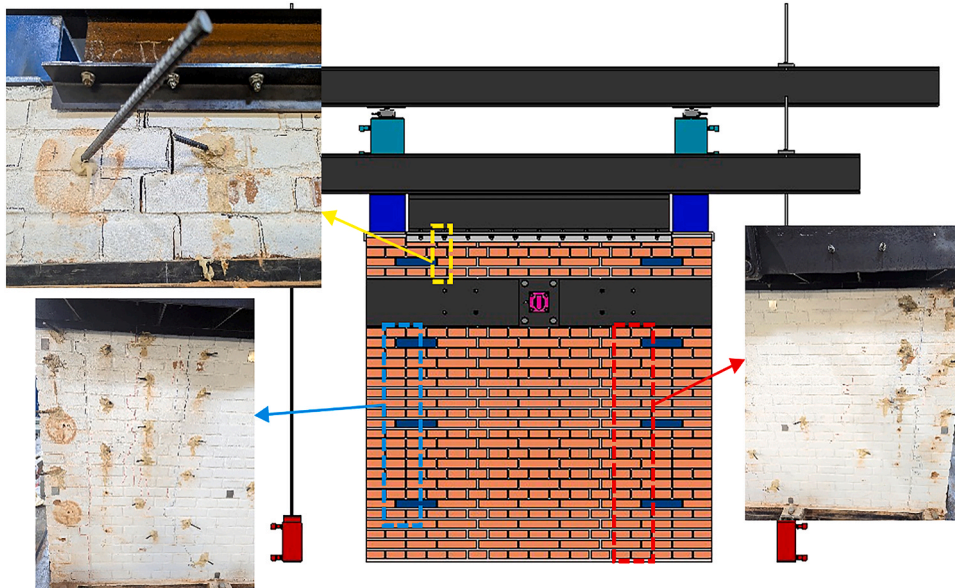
Crack pattern at the end of the test with bonded rebars – front side.
